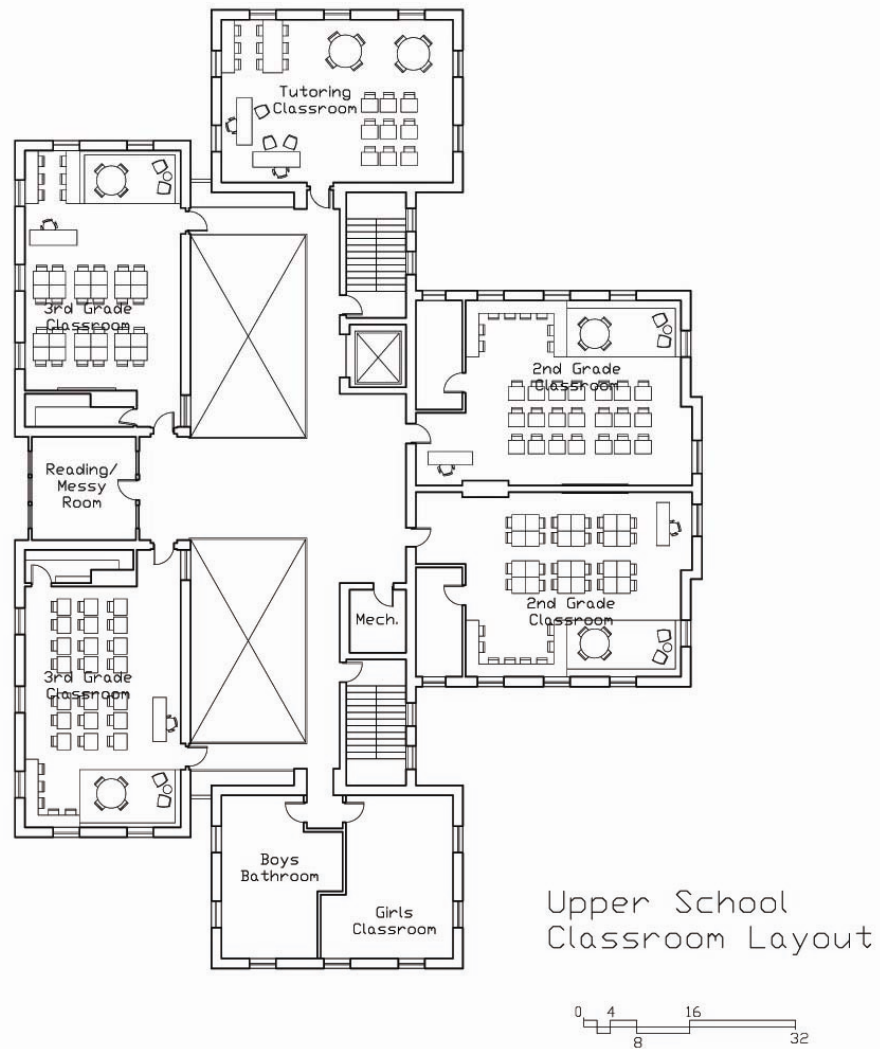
Stevens Elementary School Proposed Classroom Layout
